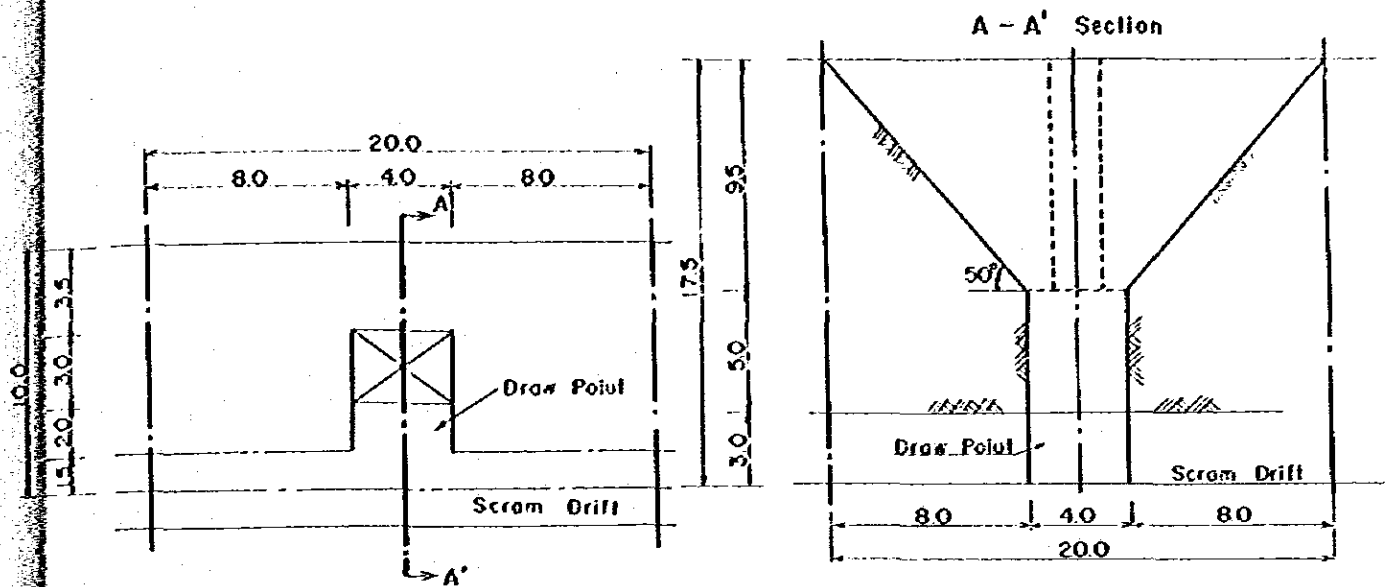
Plan and Section of Draw Cone (unit: m)
